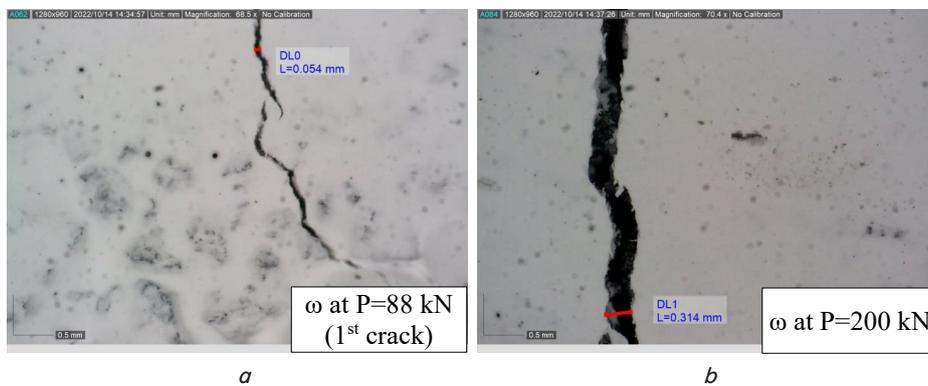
Crack width for specimens f_c' 25 MPa: a – initial crack; b – final crack
